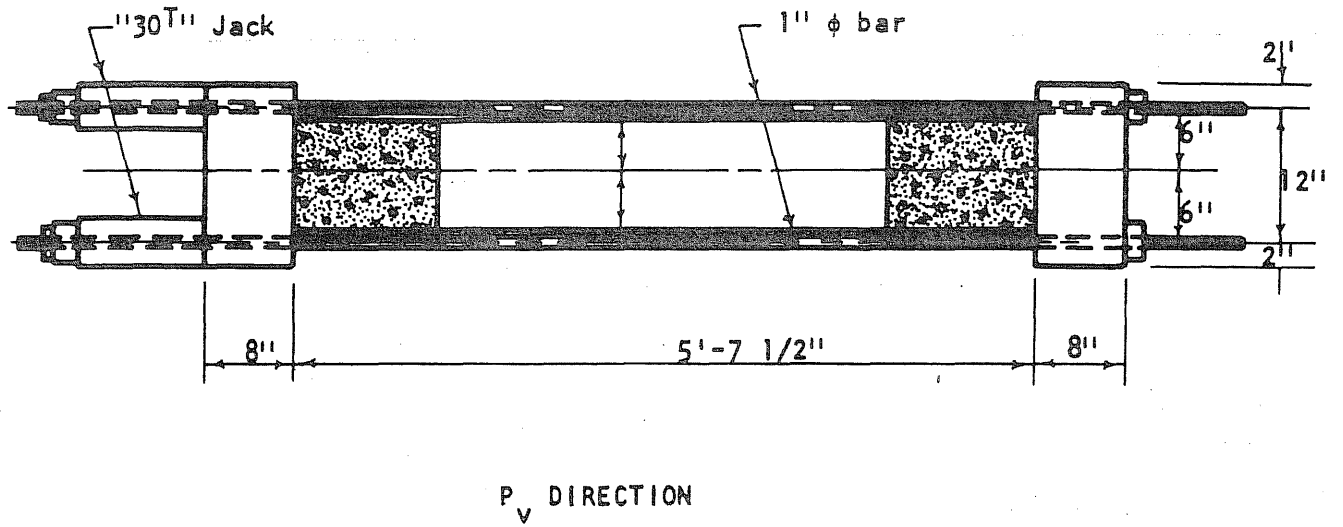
ARRANGEMENT OF LOADING UNITS
